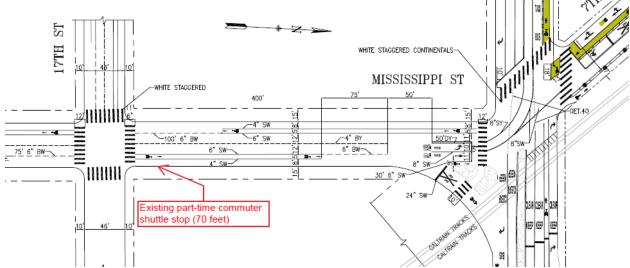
Mississippi Street from 16th Street to 17th Street – Existing Conditions
